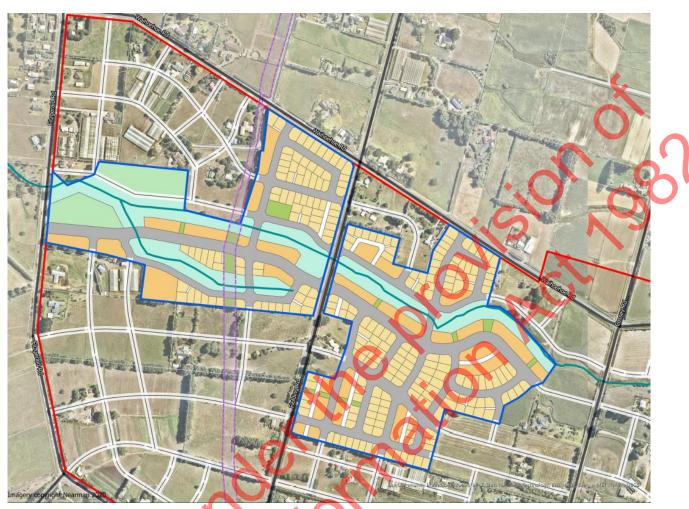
Plan of proposed development at 86 and 94 Fitzgerald Road, 251 and 383 Waihoehoe Road, 65, 76 and 108 Fielding Road
